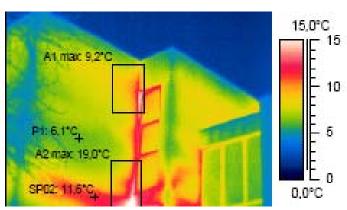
Outside view of the barrack building external wall. Air leakage through windows and cracks in the wall identified by fan-pressurization test.
